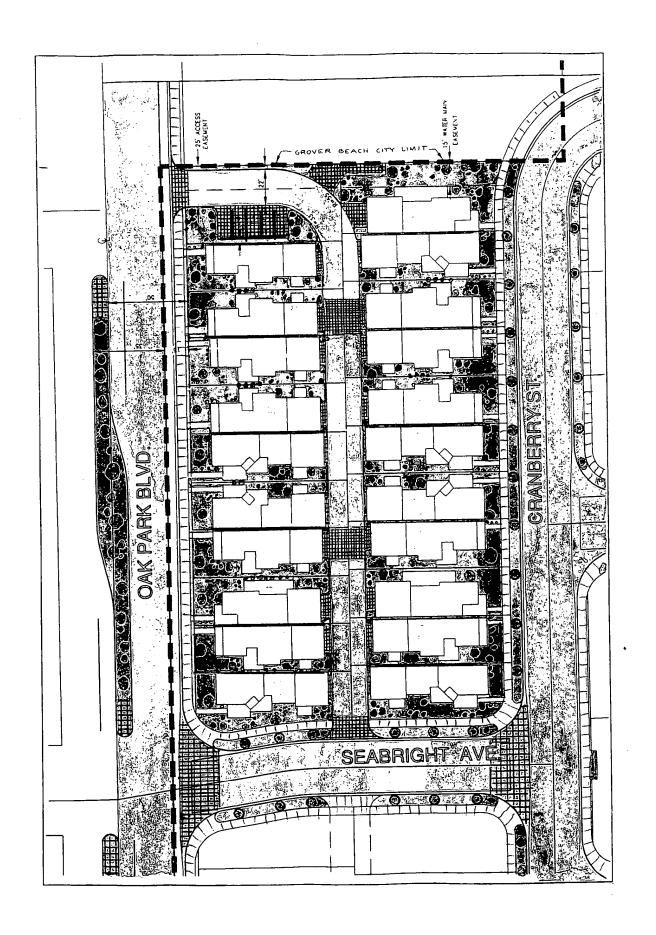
PRELIMINARY SITE PLAN - Patio Home Residential - North
